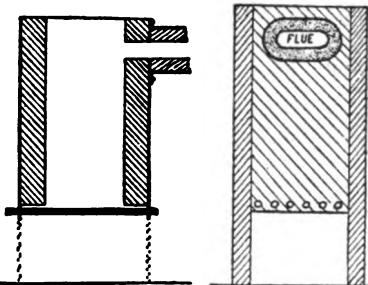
AND 7.—SECTION AND PLAN VIEWS OF FURNACE
